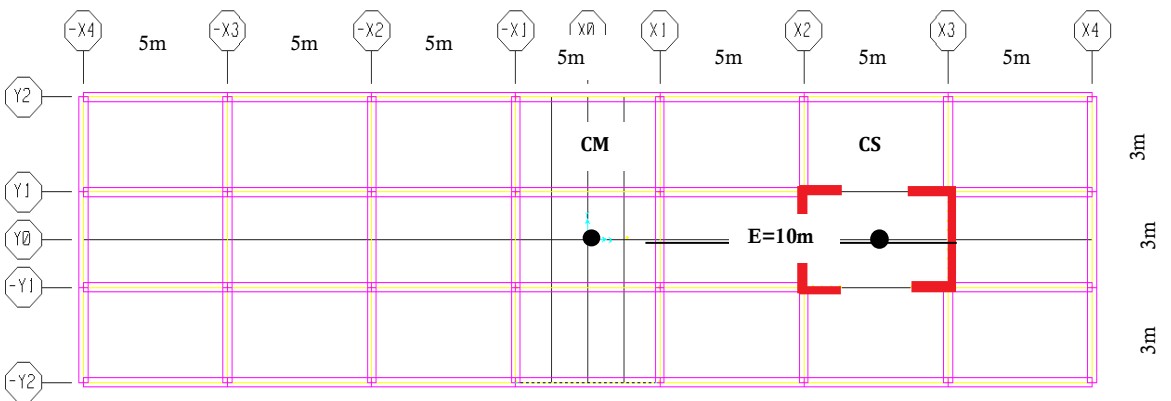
3: Structural Wall at Axis $X_2_X_3$, Type C
